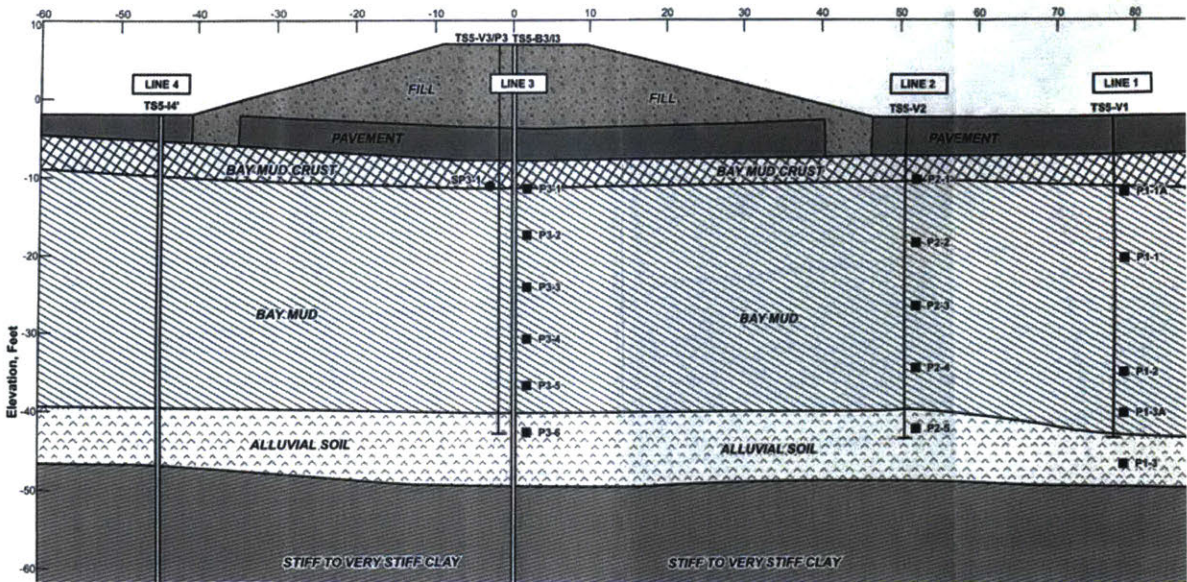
Layout of installed instruments in TS5 (URS, 2003).
